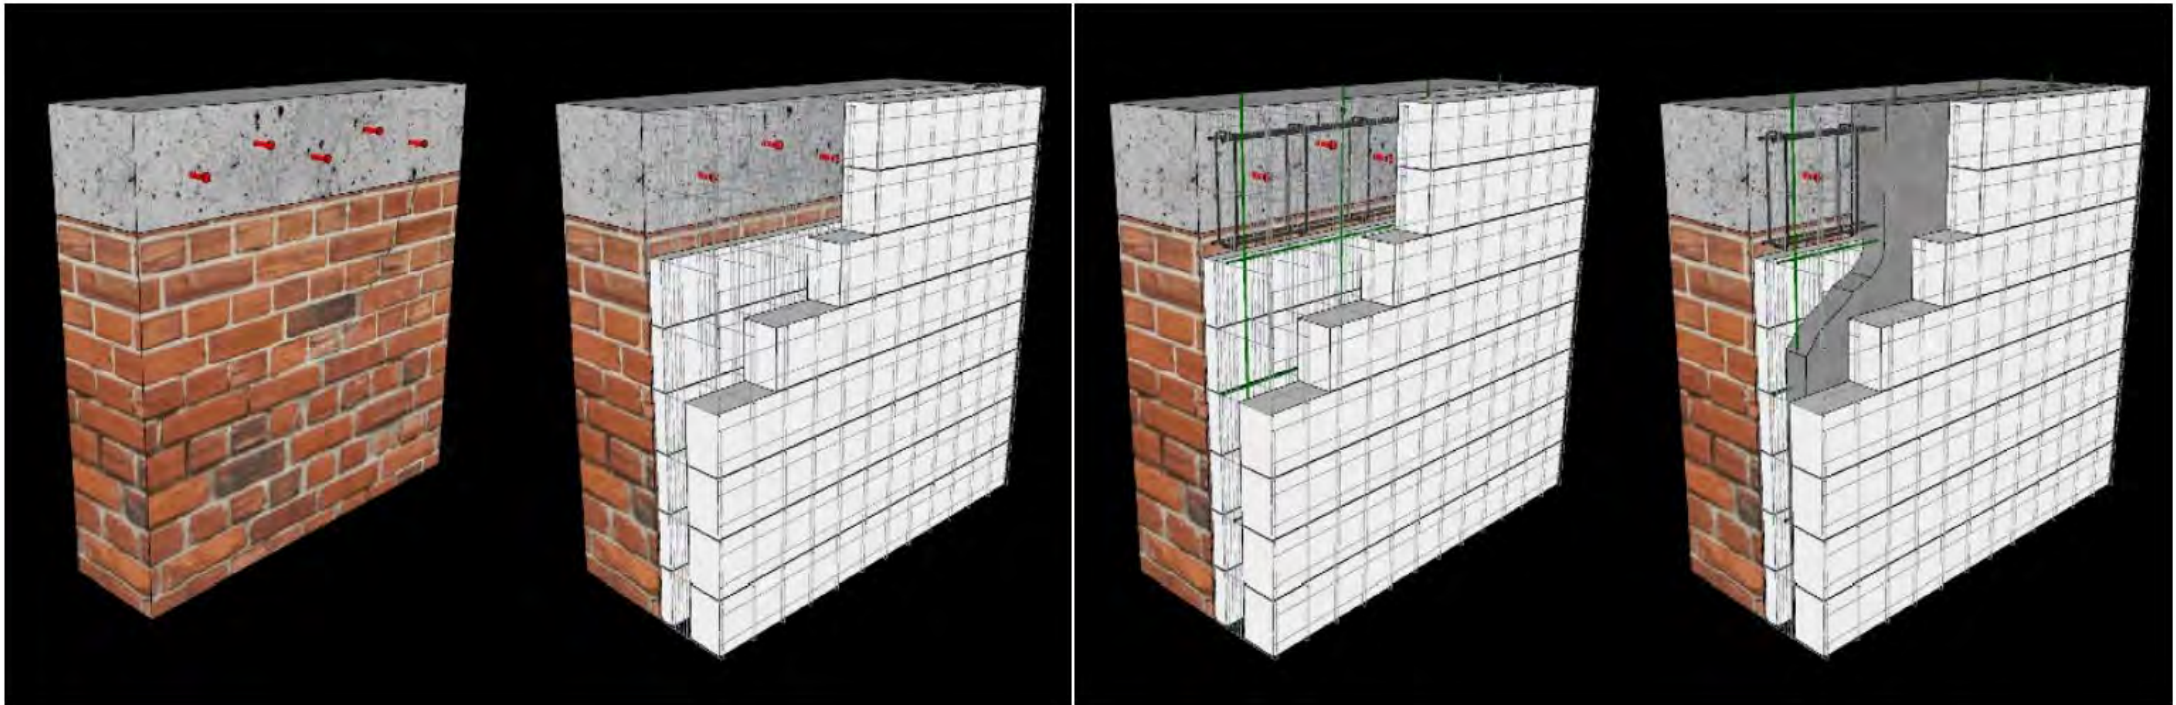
Construction phases of the ICF technology: installing the connectors, placing the insulated formwork, placing the steel reinforcement, casting the concrete.
